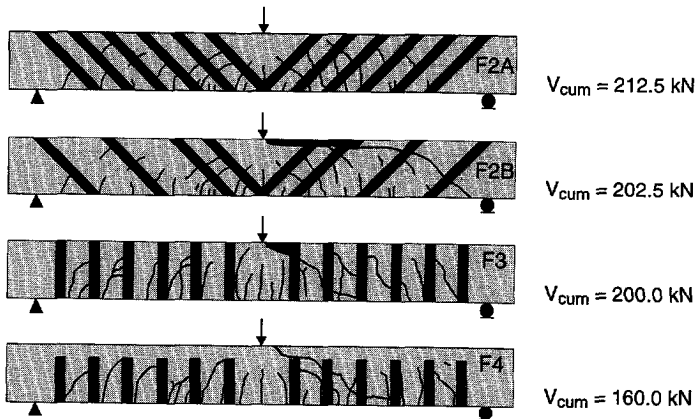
Failure of beams strengthened in shear with steel plates (Täljsten [1994]^o)
